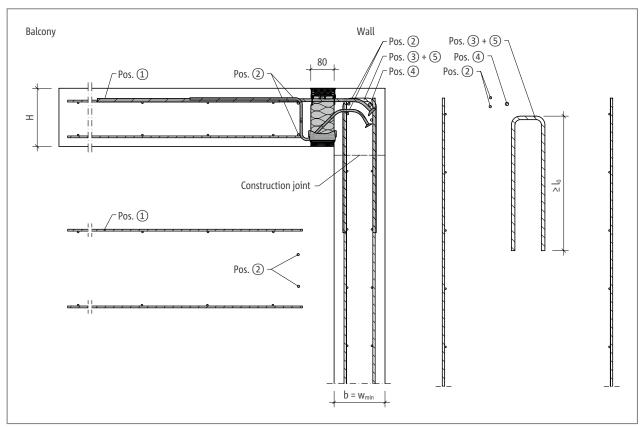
Schöck Isokorb® T type K-O: On-site reinforcement for wall connection downwards with minimum structural element dimension (w_{exist}= w_{min})
